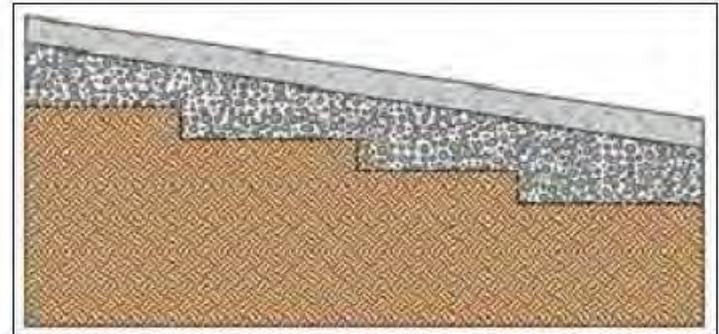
B. TERRACES IN PERVIOUS CONCRETE PAVEMENT SYSTEM RECHARGE BED WITH LONG SLOPES.
